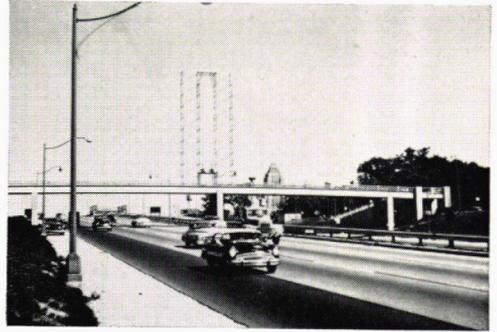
Considerable testing to determine the effect of elevation upon camera range was conducted from this specially erected tower located atop the Merrick pedestrian bridge. A motorized elevator located between the two towers allowed the camera to be raised from the surface of the bridge to points up to 45 feet above the bridge surface.
